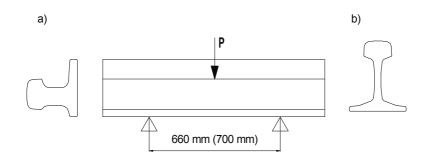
Three-point transverse bending of the switch blade I60 (a) and wing rail (b) sections.
